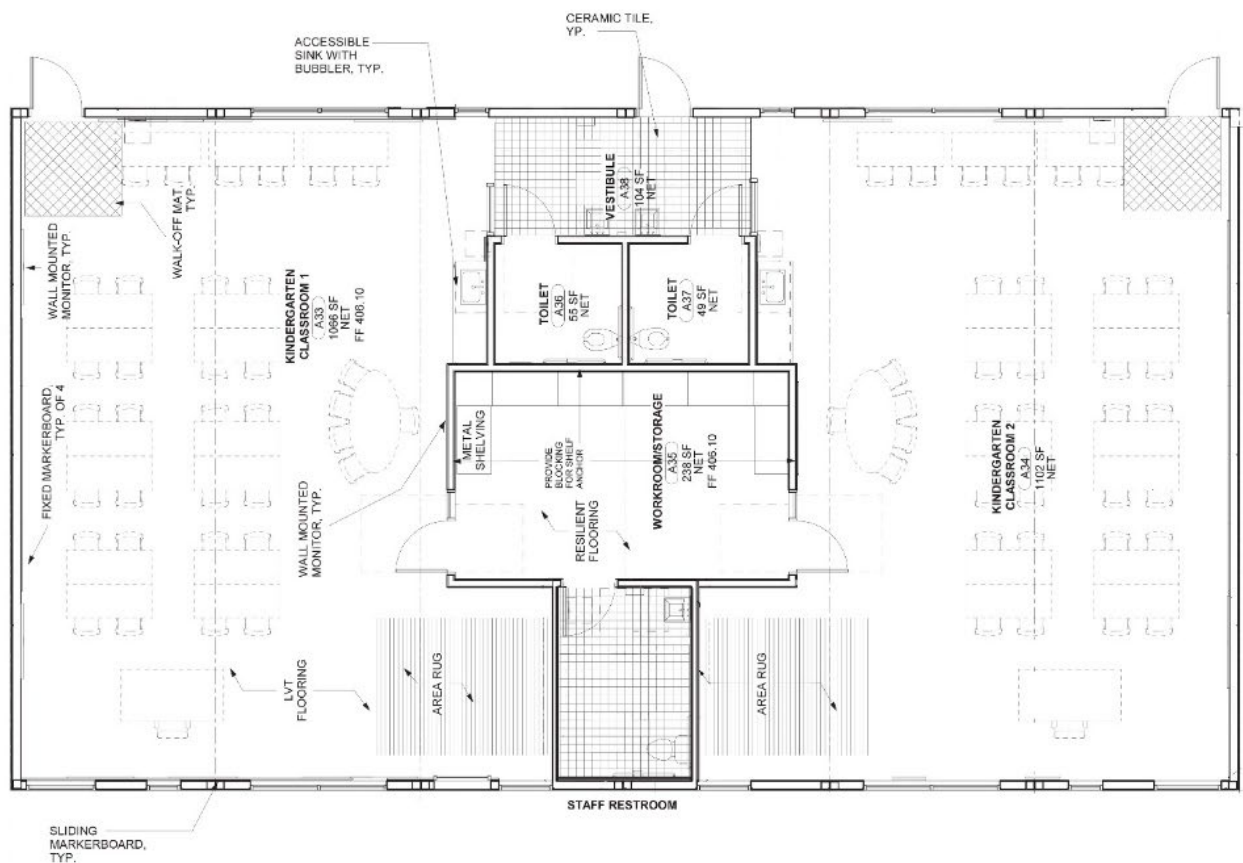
Drifill Elementary Proposed Locations of New Preschool, TK, and K Classrooms
